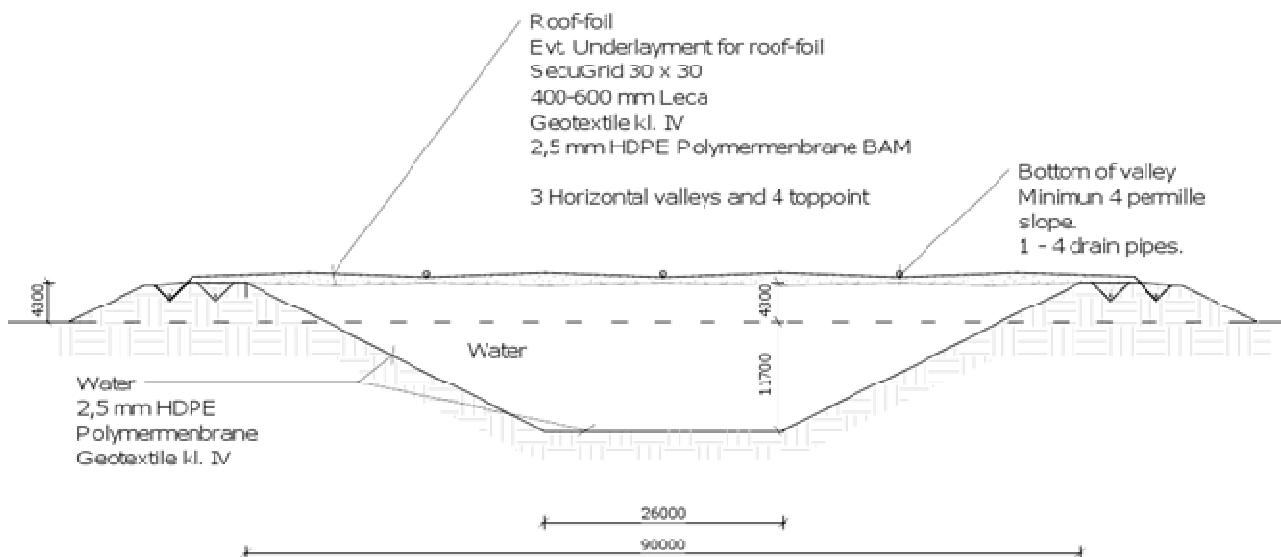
Construction Cross section of the 75,000 m<sup>3</sup> PTES in Marstal. (Source: PlanEnergi)
